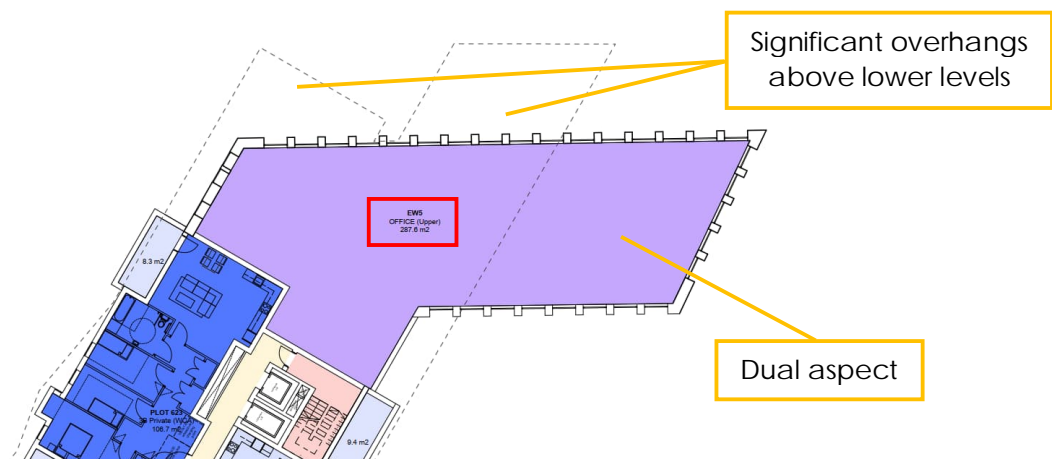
Plan view of the upper ground level of Distel Apartments (office use)
